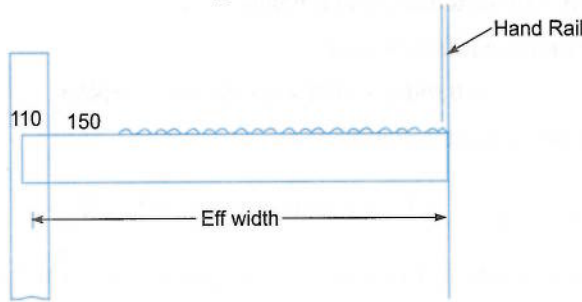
Stairs spanning longitudinally, built into wall on one side.
